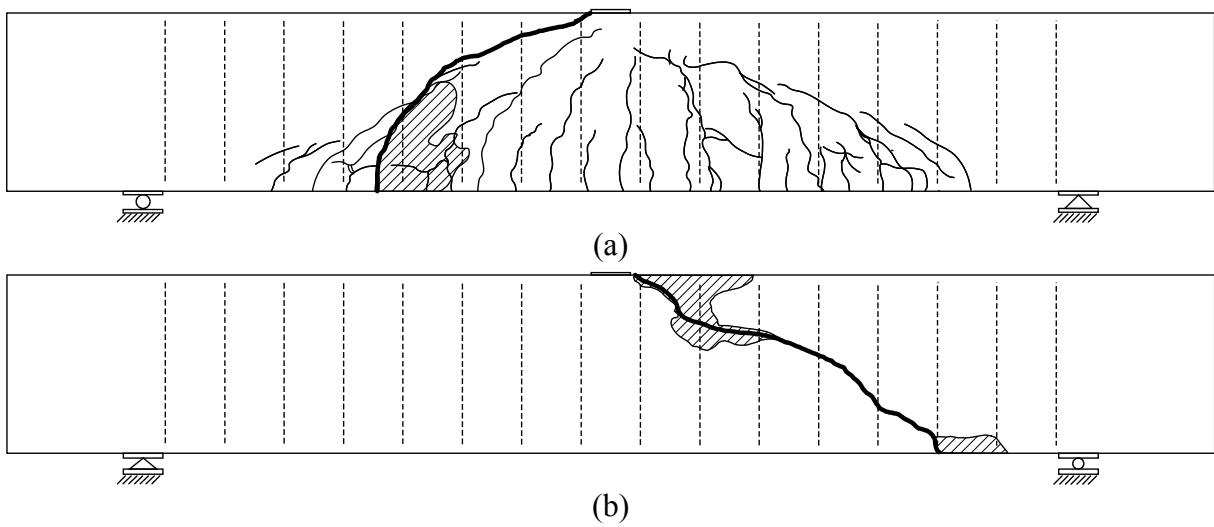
Observed damage in specimen P1S5, (a) front side, (b) back side
